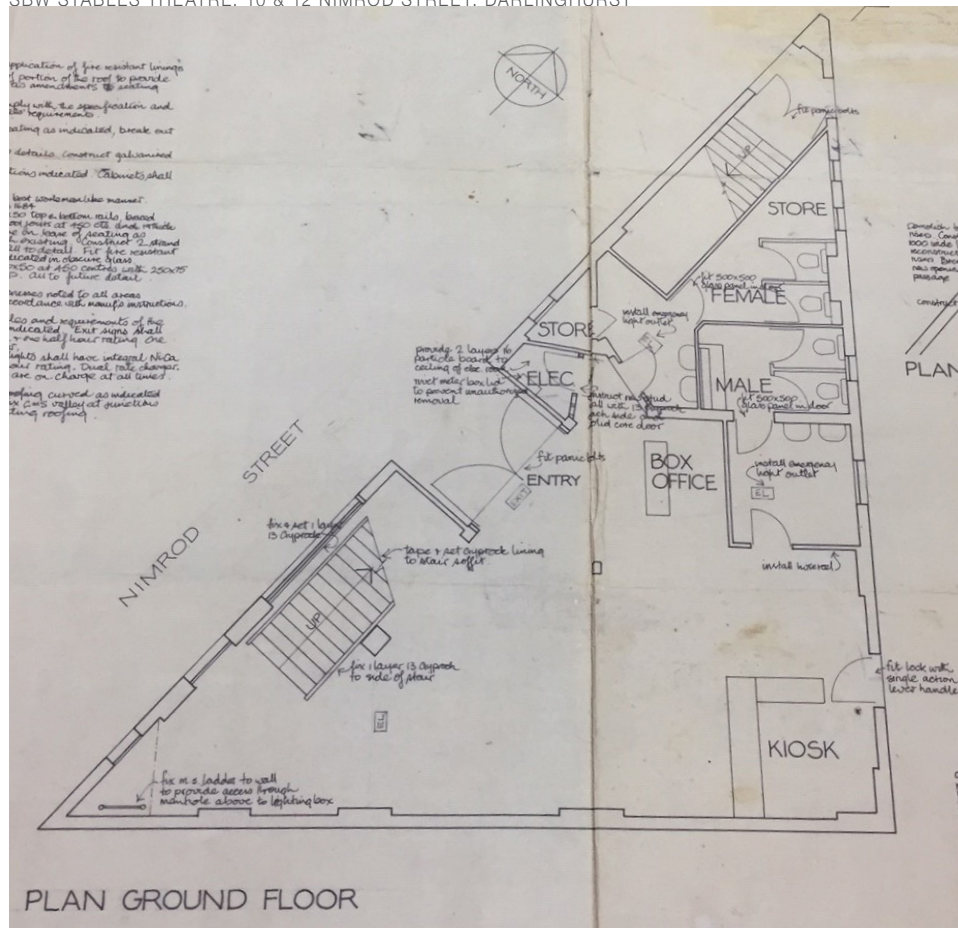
1986. Plan Ground Floor, Minor Works, Stables Theatre. Geoffrey R. Watson Architect. Source: SBW Foundation Archives.
